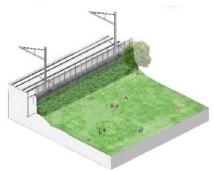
Conceptual rendering of rail line on embankment, with retaining wall adjacent to open space, Ontario Line (Metrolinx)
